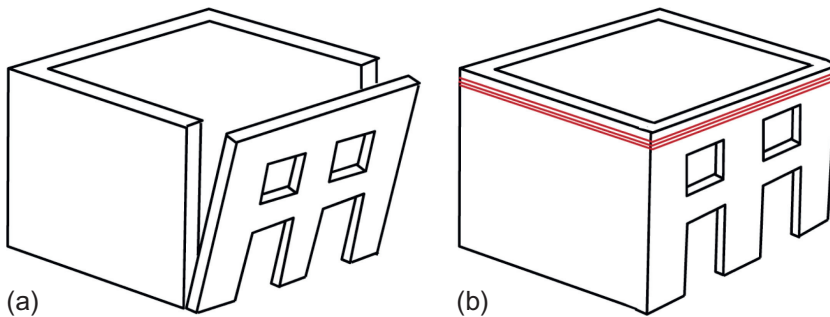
(a) Collapse by overturning and (b) application of embracing belt.
